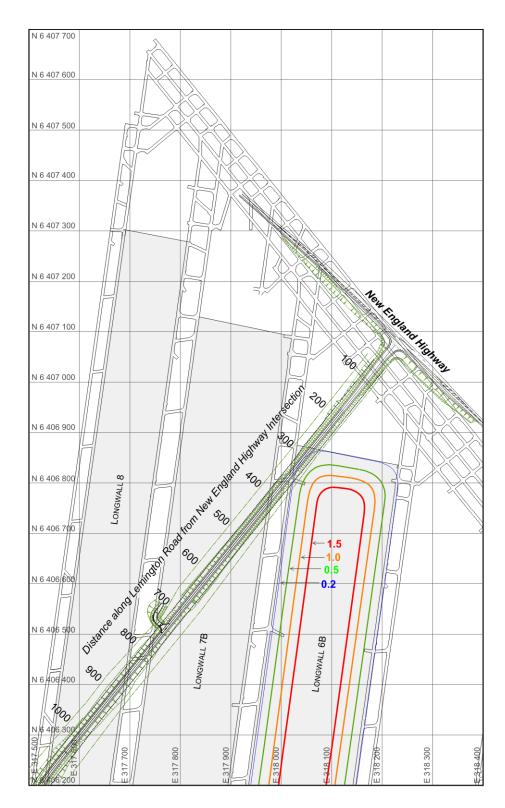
Site plan showing expected subsidence from Longwall 6B.
